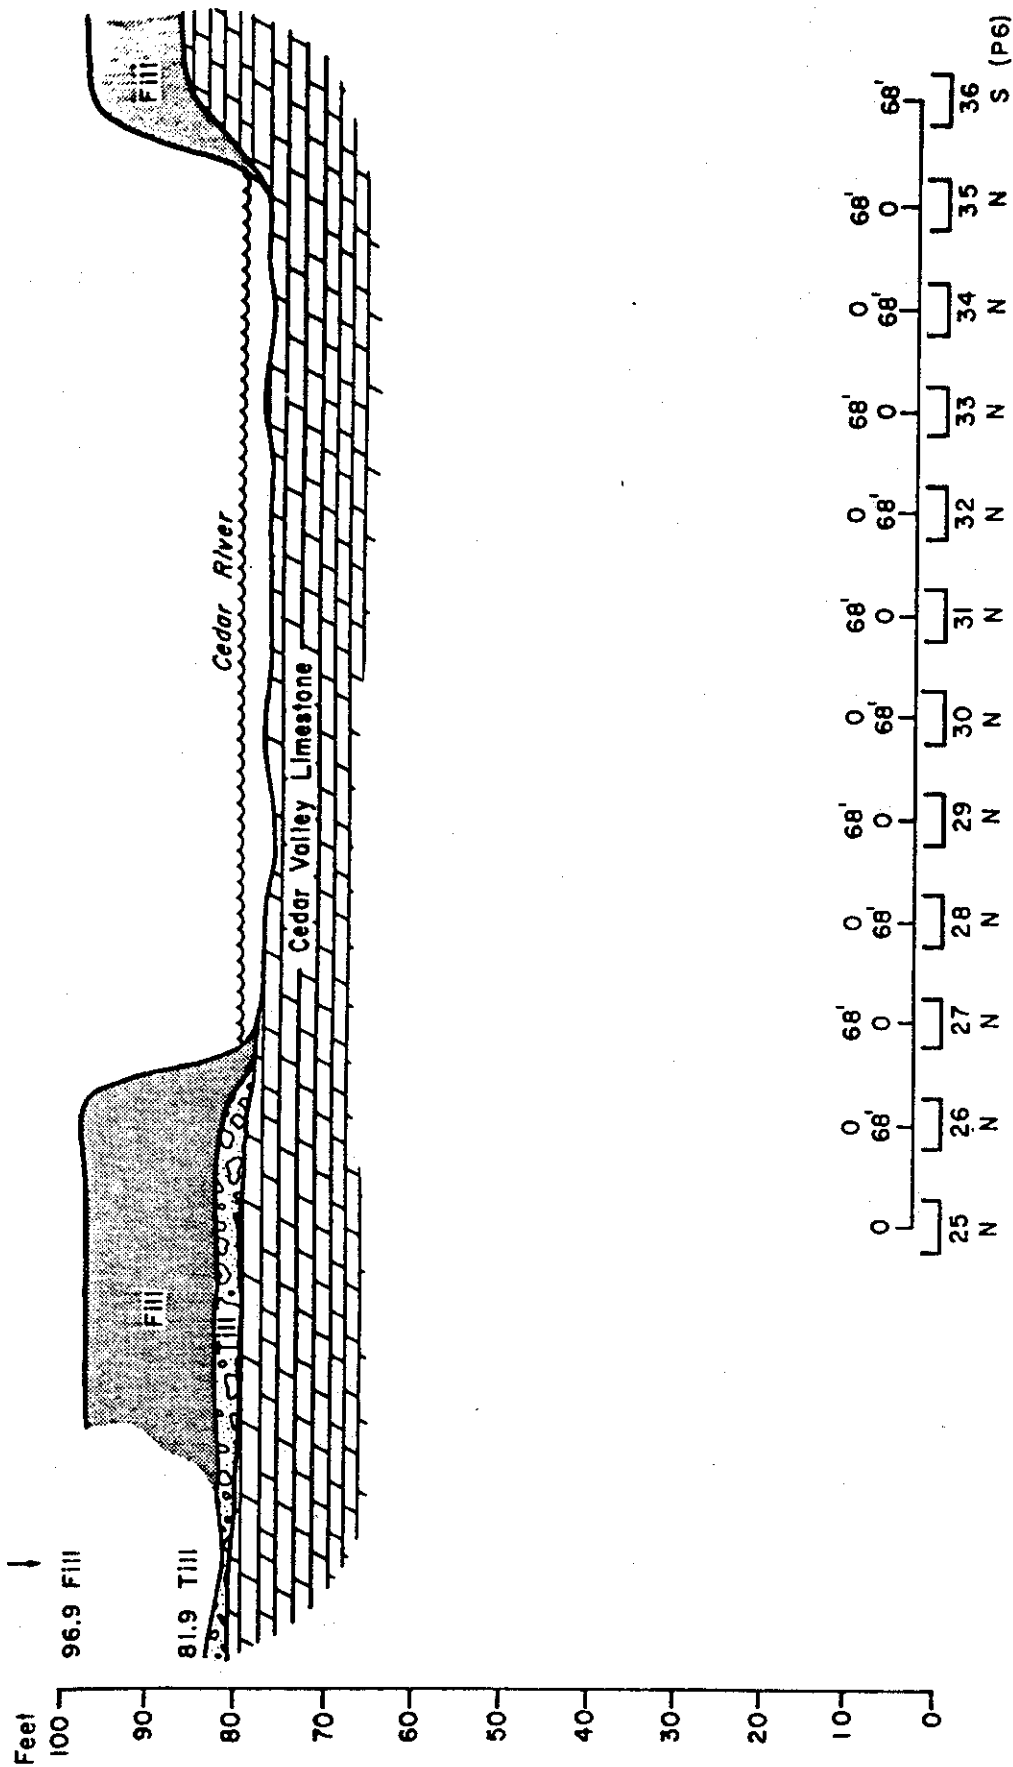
A cross-section of the Cedar River valley at the site of the 5-in-1 bridge and dam.
